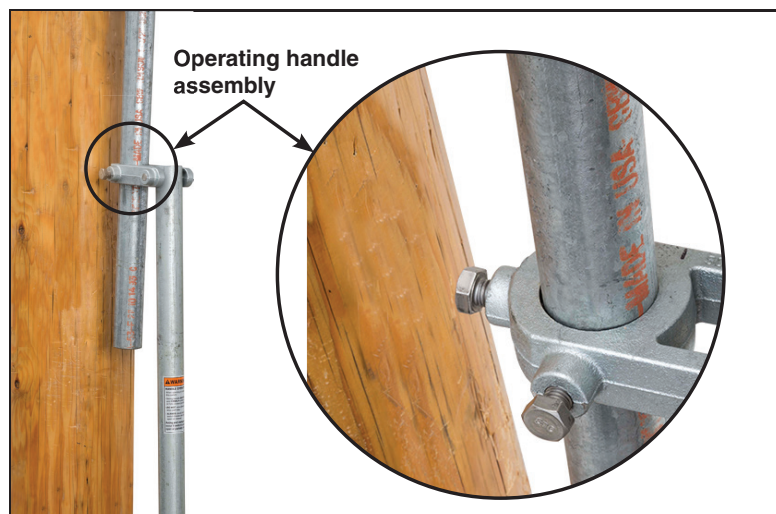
Slide the operating handle yoke up the handle assembly. Hand tighten the set screw, but do not pierce the pipe.
